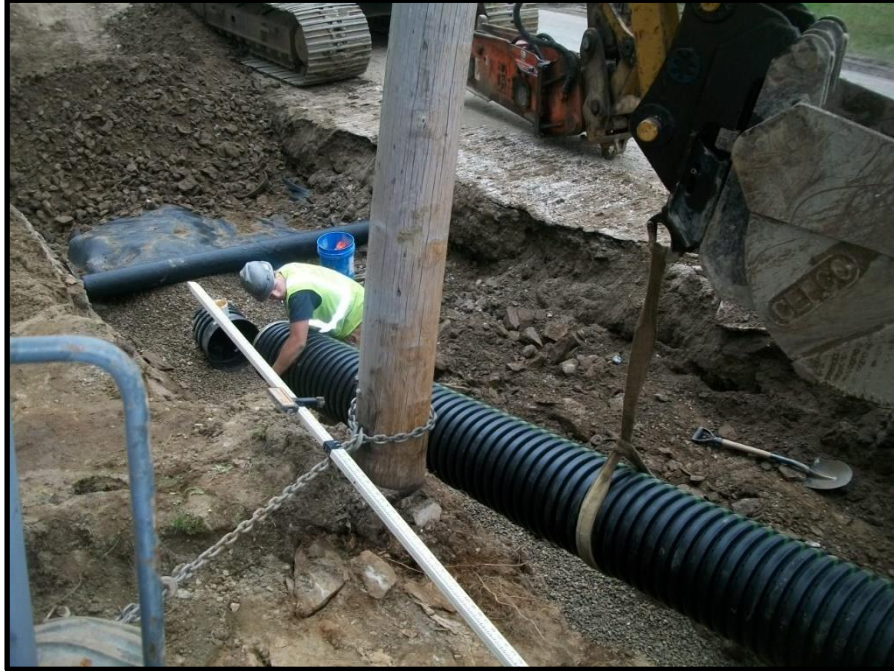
30-inch diameter HDPE culvert at outlet near STA 78+27.
